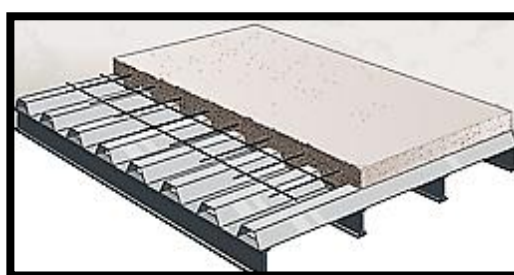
Trapezoidal sheet floor slab. (Source: Leca)
